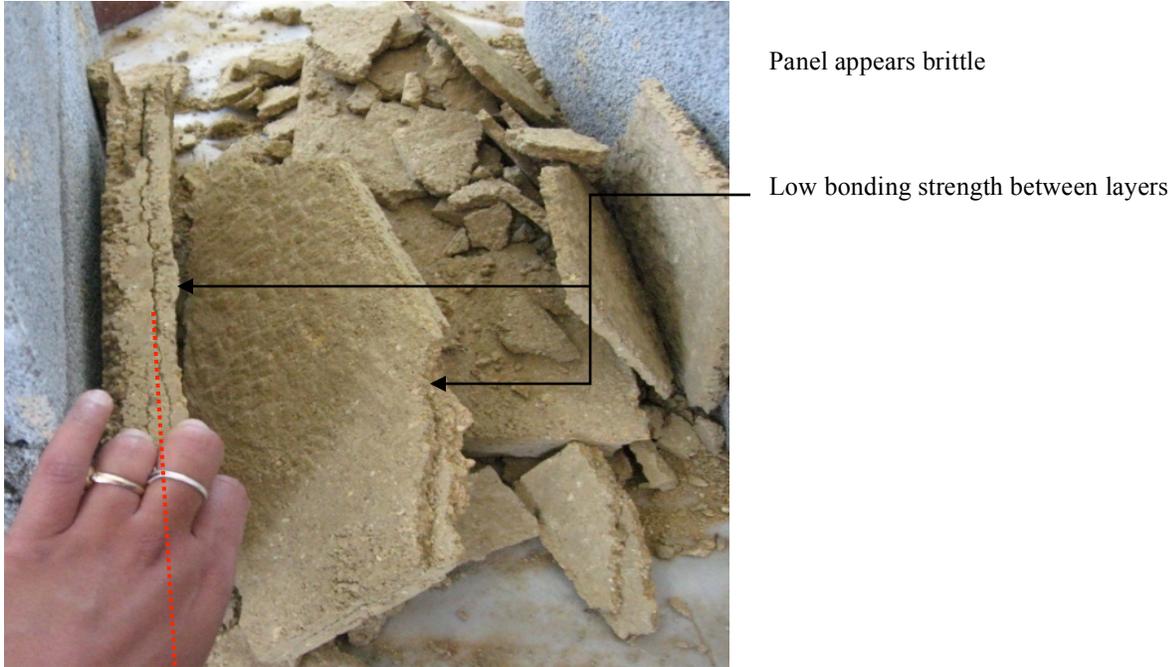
Image showing fragmented portions after applying Load test on Panel-1 Earth + Cement
